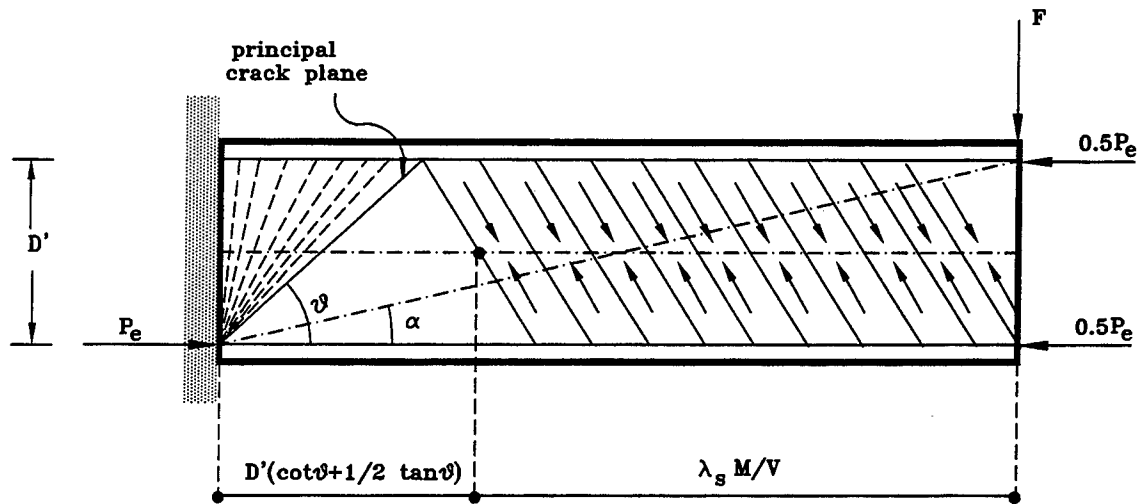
B and D Regions in a Cracked Reinforced Concrete Column Element
